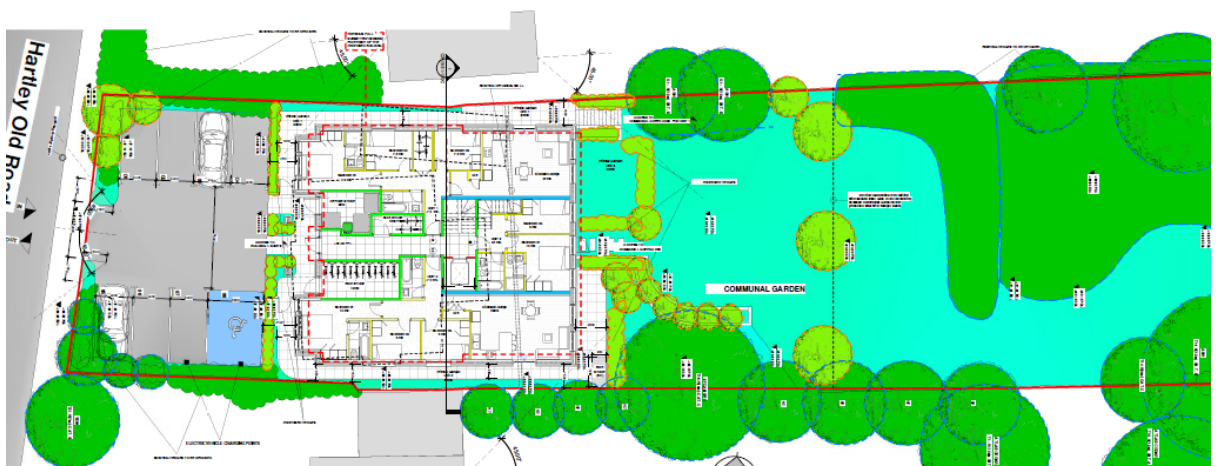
Proposed first floor site plan showing proposal in relation to neighbouring properties
